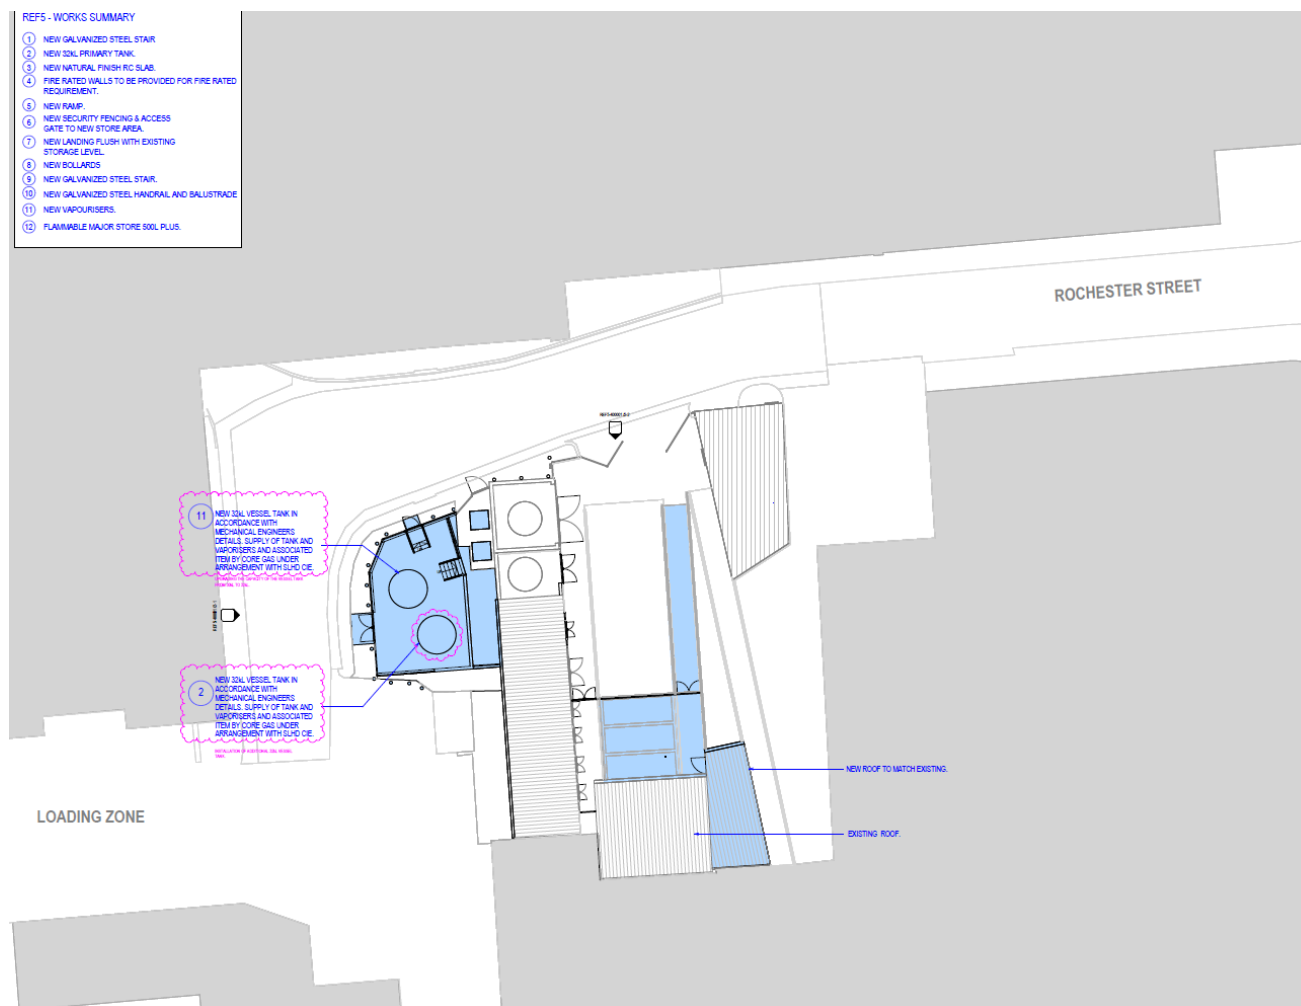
Amended Proposal - Roof Plan (source: Jacobs dated 21 February 2025)
